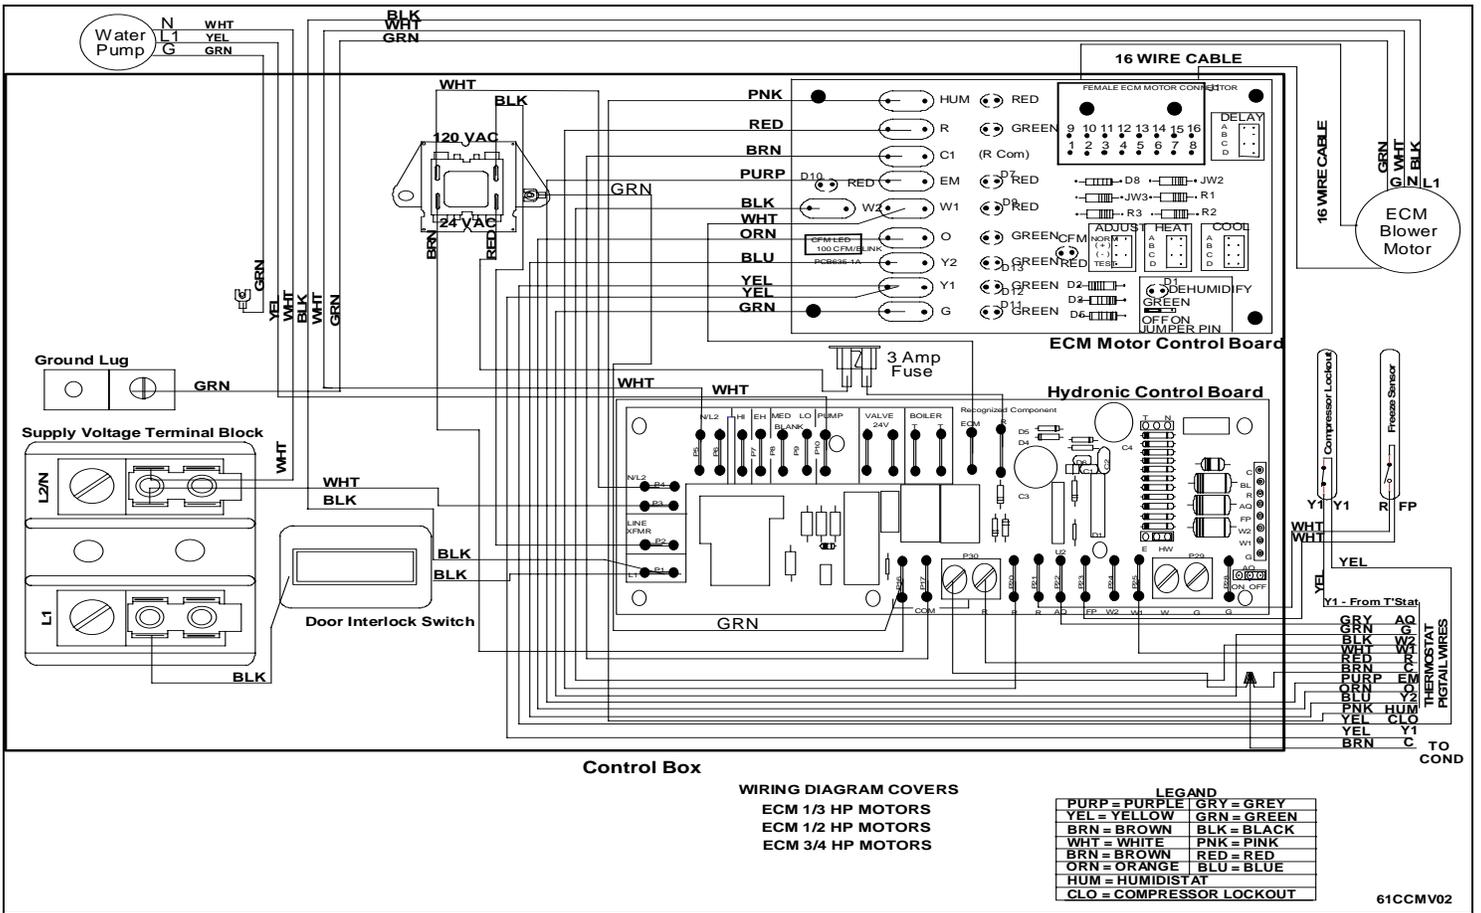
MMVE 18-36 – ECM 2.3 – Hydronic Heat with Pump – No Choke.
